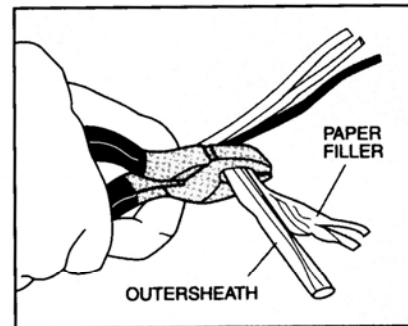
F-2. Remove the outer sheathing and inner paper lining.
